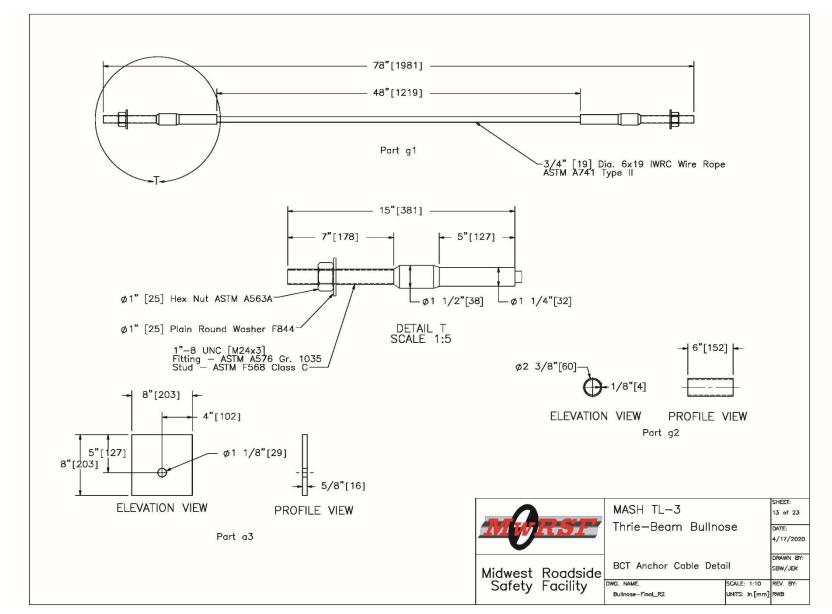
BCT Anchor Cable Detail, Bullnose Final
